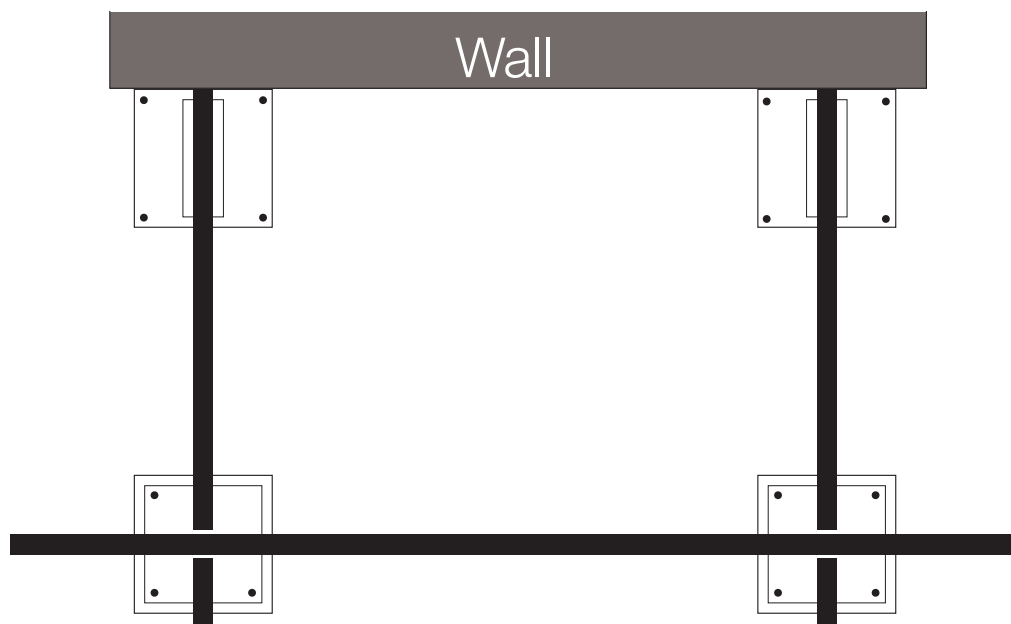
B: Top View of Perimeter at Wall, Column, Curb, Doorway or Exposed Edge
